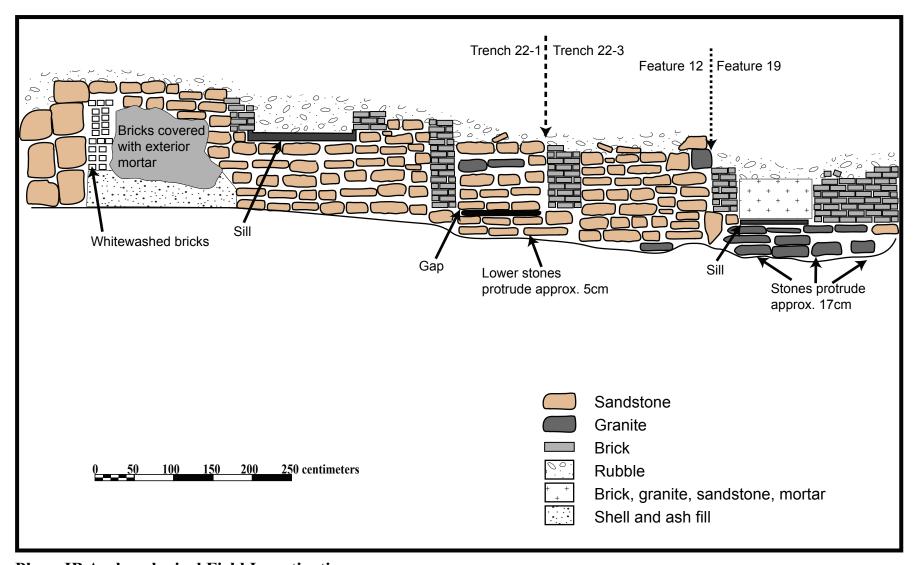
Profile of East Wall of Trenches 22-1 and 22-3 (Features 12 and 19).
